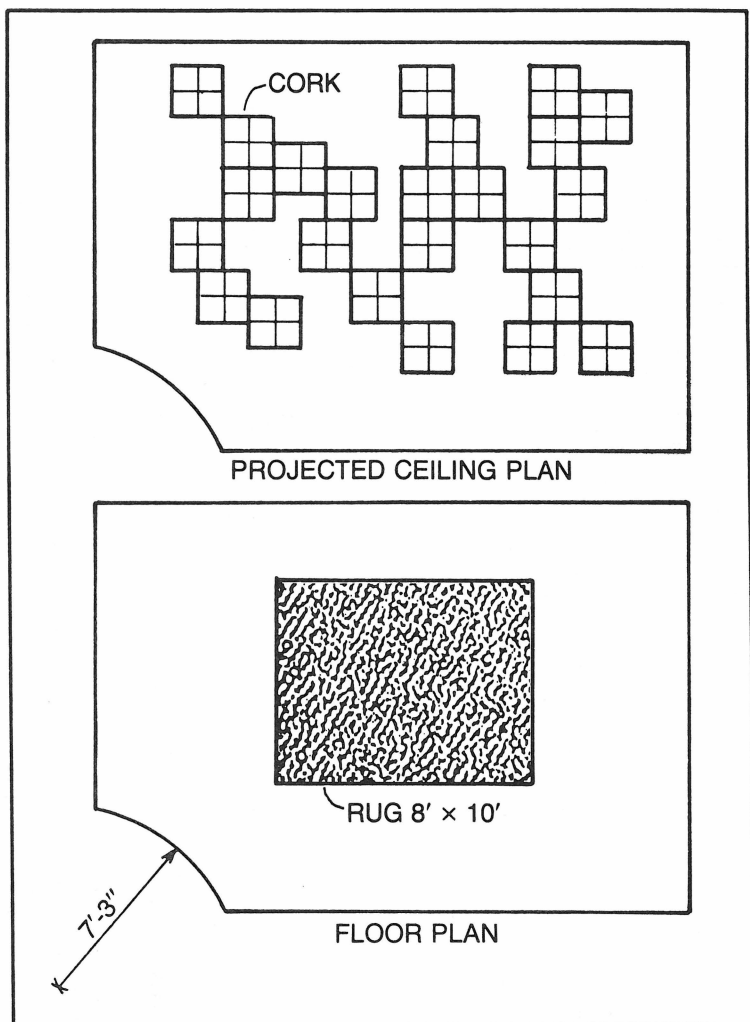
Projected ceiling and floor plan of music studio. Cork tiles 1 inch thick are arranged in a pattern on the ceiling and an 8 foot \times 10 foot rug is placed anywhere on the floor dictated by microphone placement.
